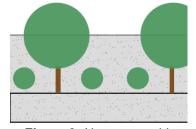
Non-permeable fencing – brick wall to 1800mm with integrated planter
